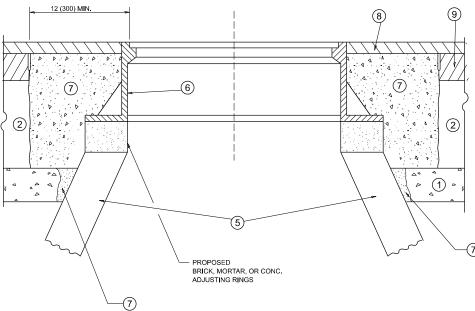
# DETAILS FOR FRAMES AND LIDS ADJUSTMENT
